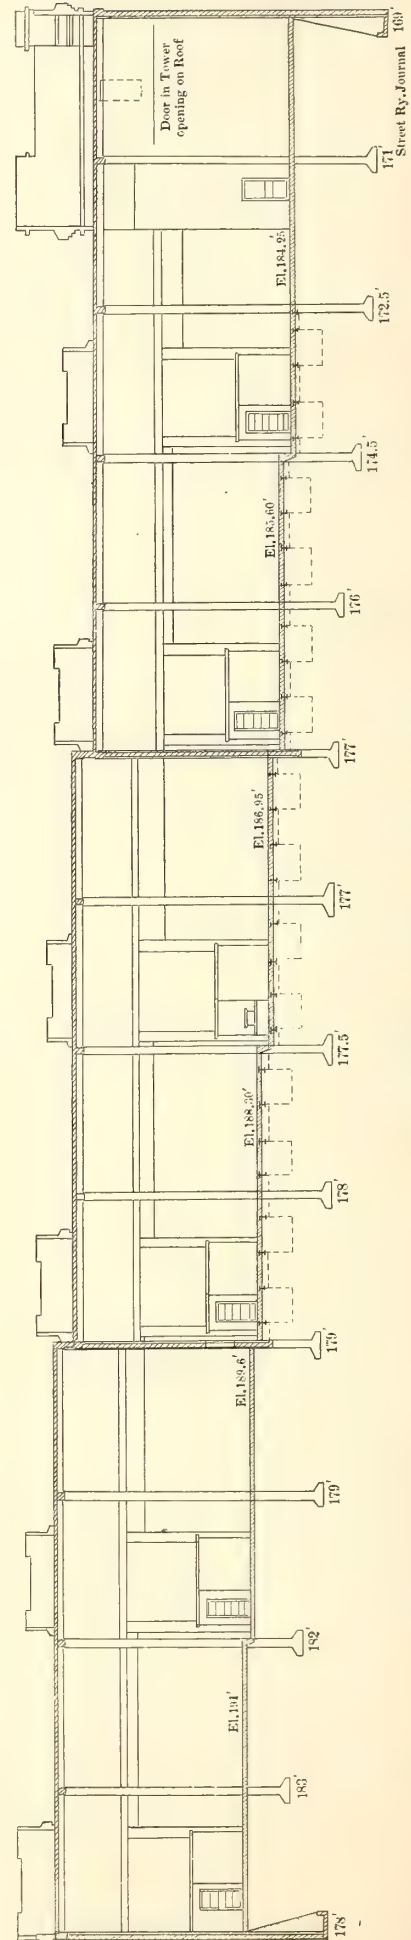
TRANSVERSE SECTION, LOOKING NORTH
